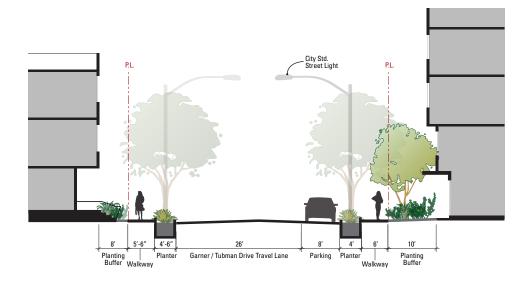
Section G. Garner Drive and Tubman Drive typical section
